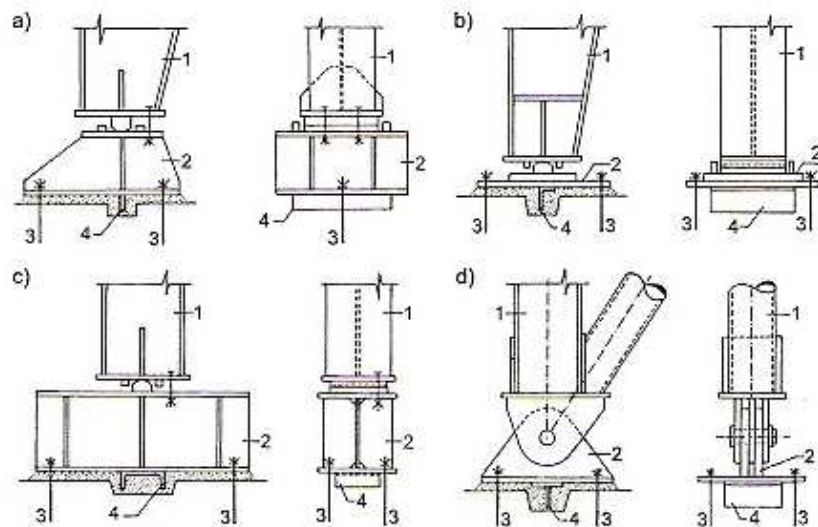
Examples of pin-base columns: 1- column, 2- bearing plate, 3- anchor bolt, 4- cleat
